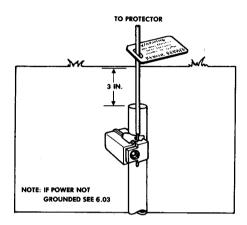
Power Other than MGN Grounded to Inaccessible Ground Rod—No Water Pipe
